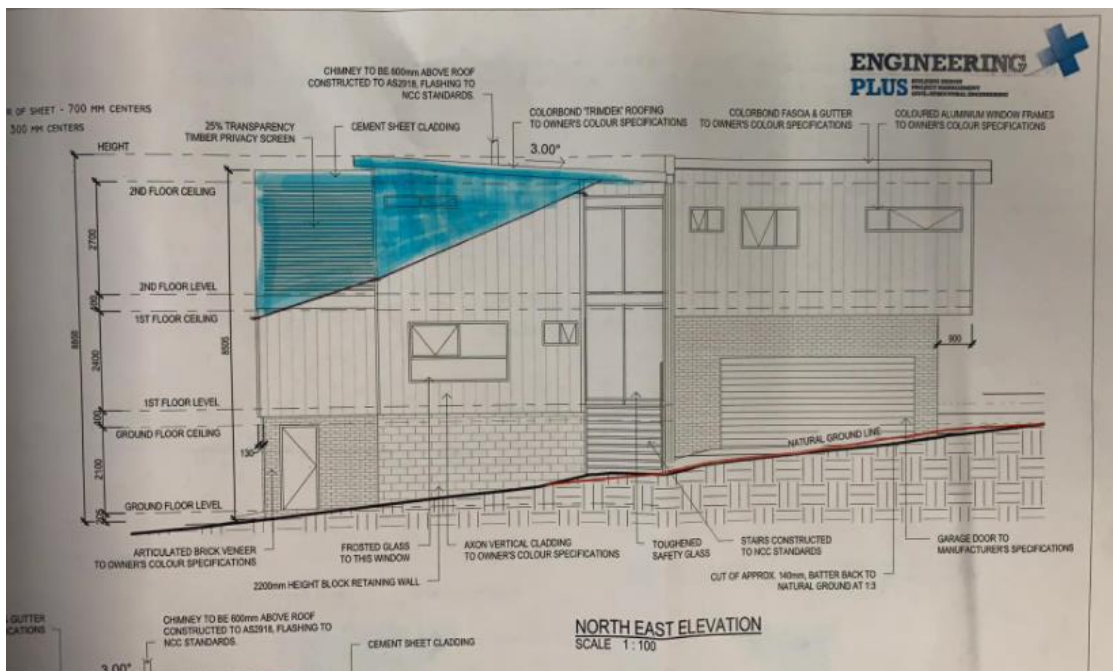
, North Eastern elevation (dwelling as evident from 3-5 Garnet Avenue).
